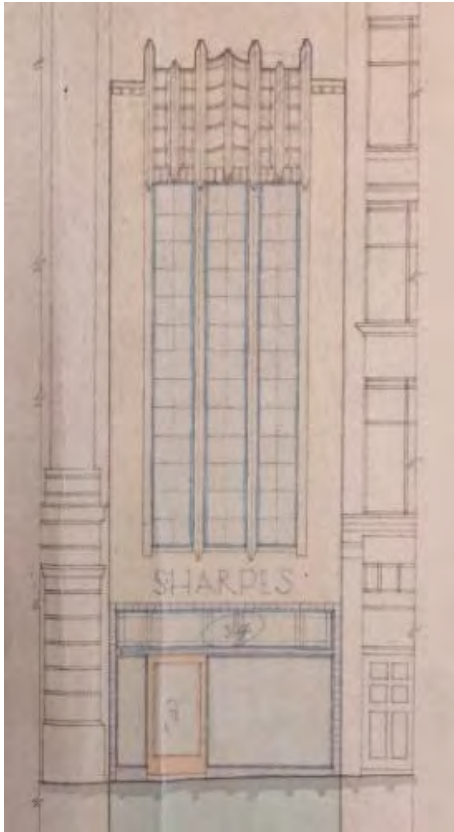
H W & F B Tompkins' drawing for the subject building at 188 Bourke Street, Melbourne, which was to be occupied by Sharpe Bros. (Source: PROV VPRS 11201/P1/382)
